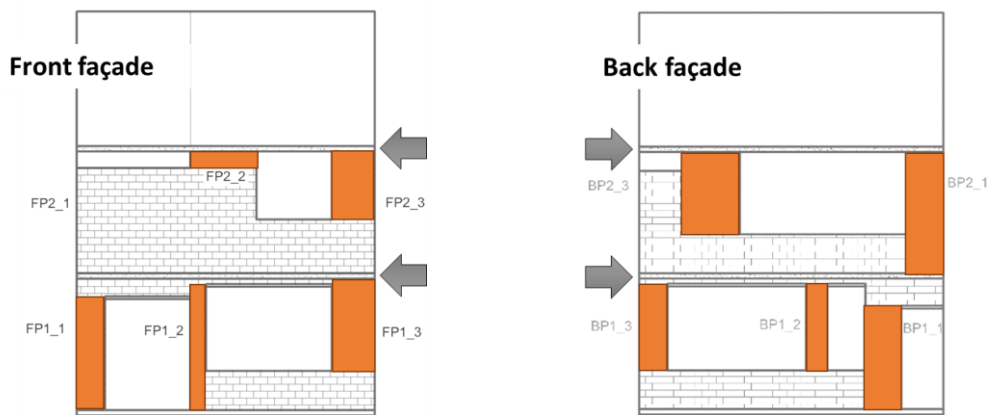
Piers defined on the front and back façades of Building B for negative loading.
